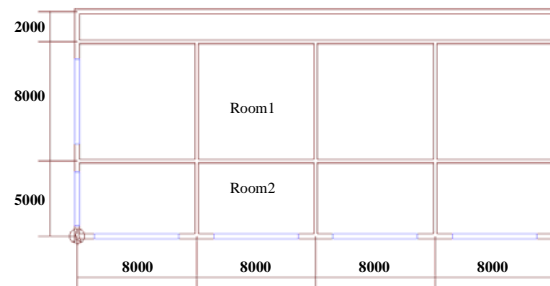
Layout plan of the Case Study Building (Unit: mm)
